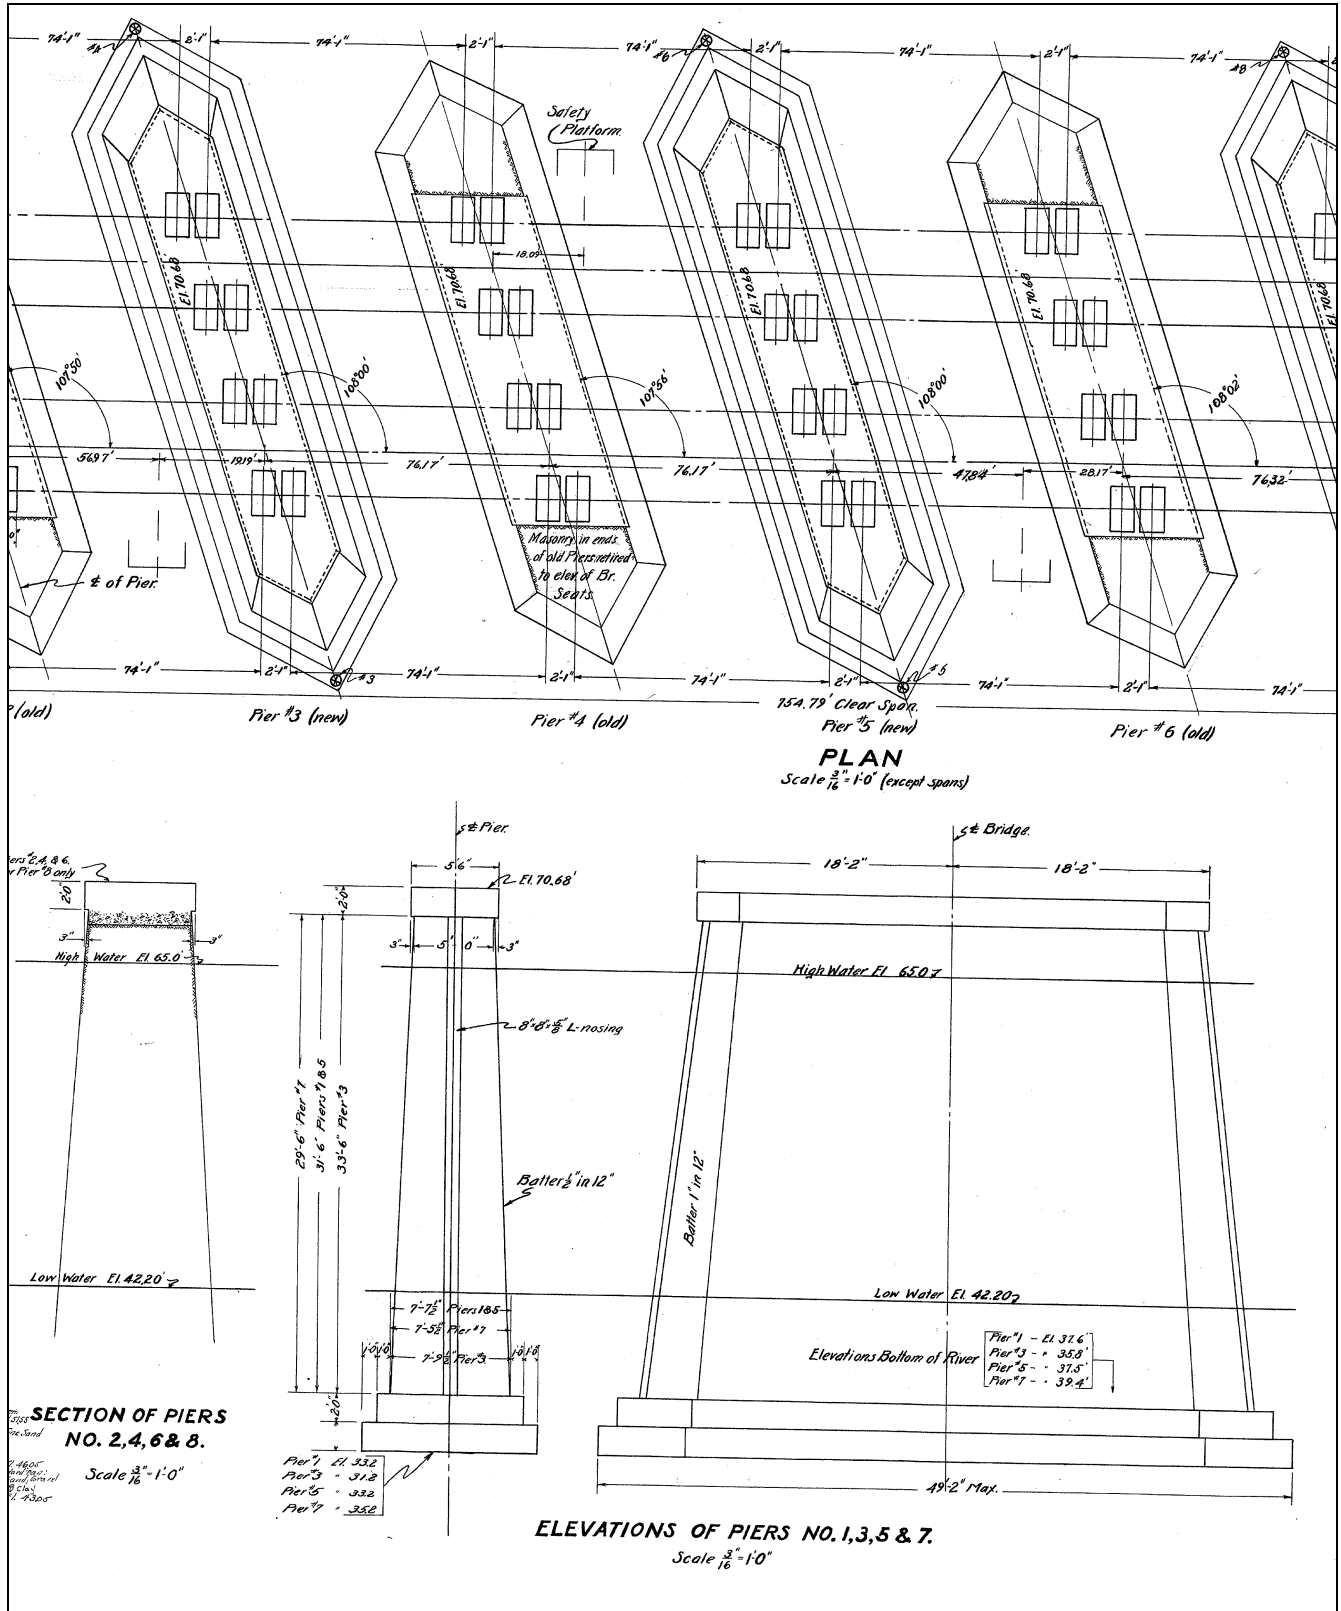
Portion of original plan sheet showing plan and elevation of typical stone and concrete piers (source: Massachusetts Bay Transportation Authority files).
